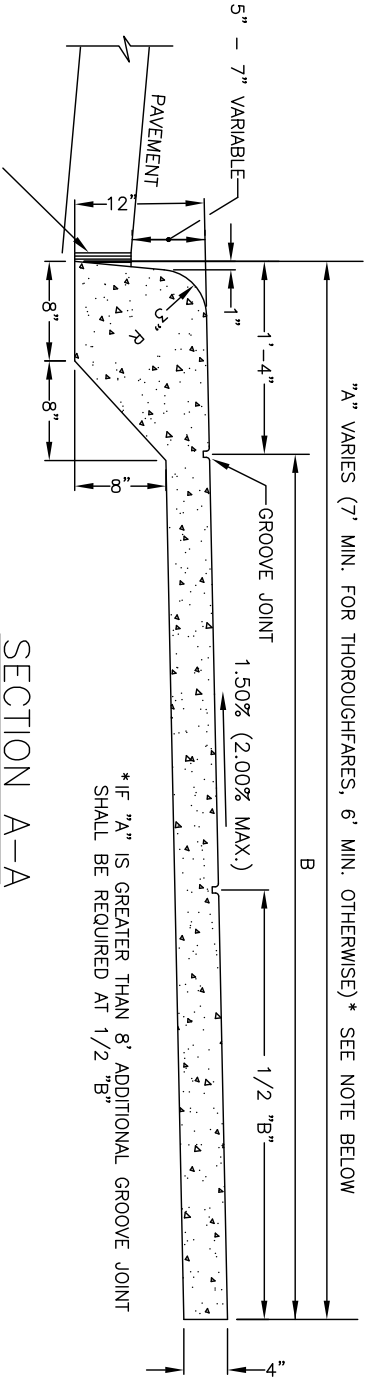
DETAILS SHOWING EXPANSION JOINTS IN CONCRETE SIDEWALK
